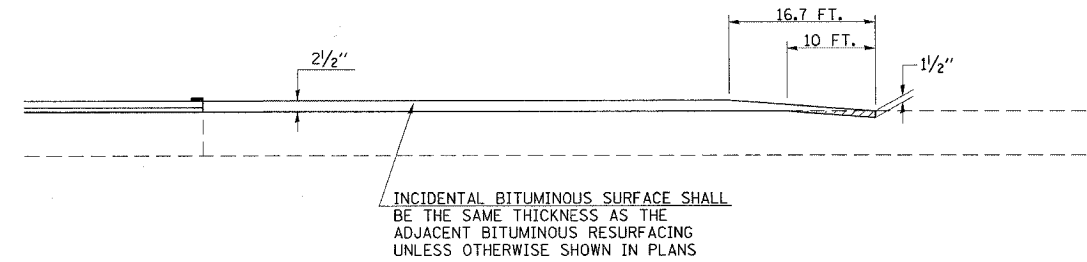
DETAIL OF RUNDOWN BETWEEN MAINLINE AND RAMPS
